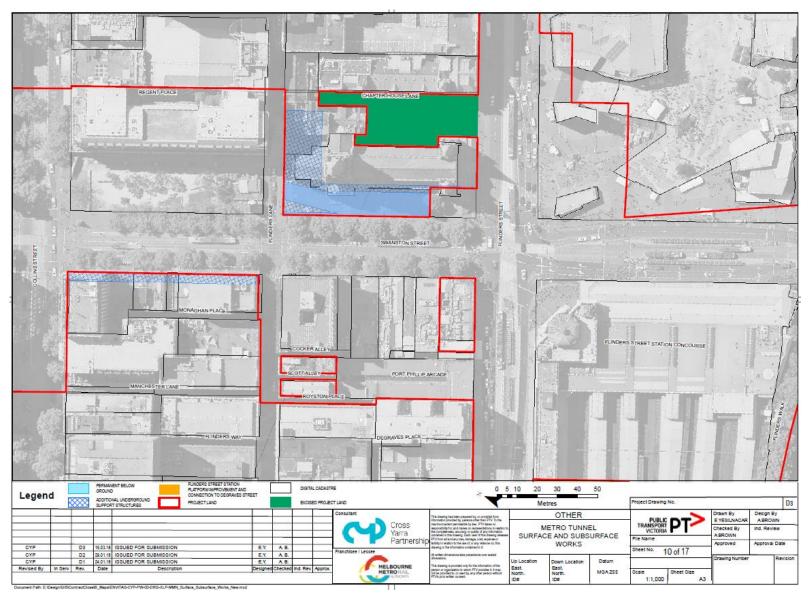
ADDITIONAL PROJECT LAND REQUIRED FOR UNDERGROUND SUPPORT STRUCTURES, TUNNEL ALIGNMENT AT CBD SOUTH STATION AND EXCISED LAND
